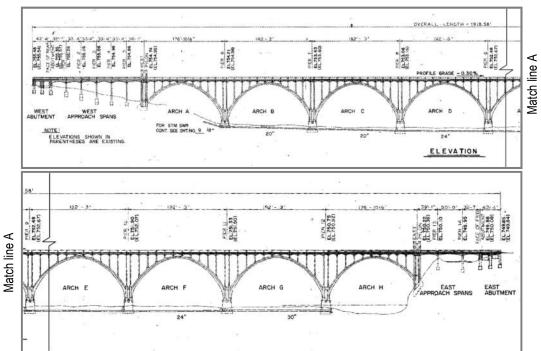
CUY-17-0283 South Elevation (taken from the major rehabilitation plans).
